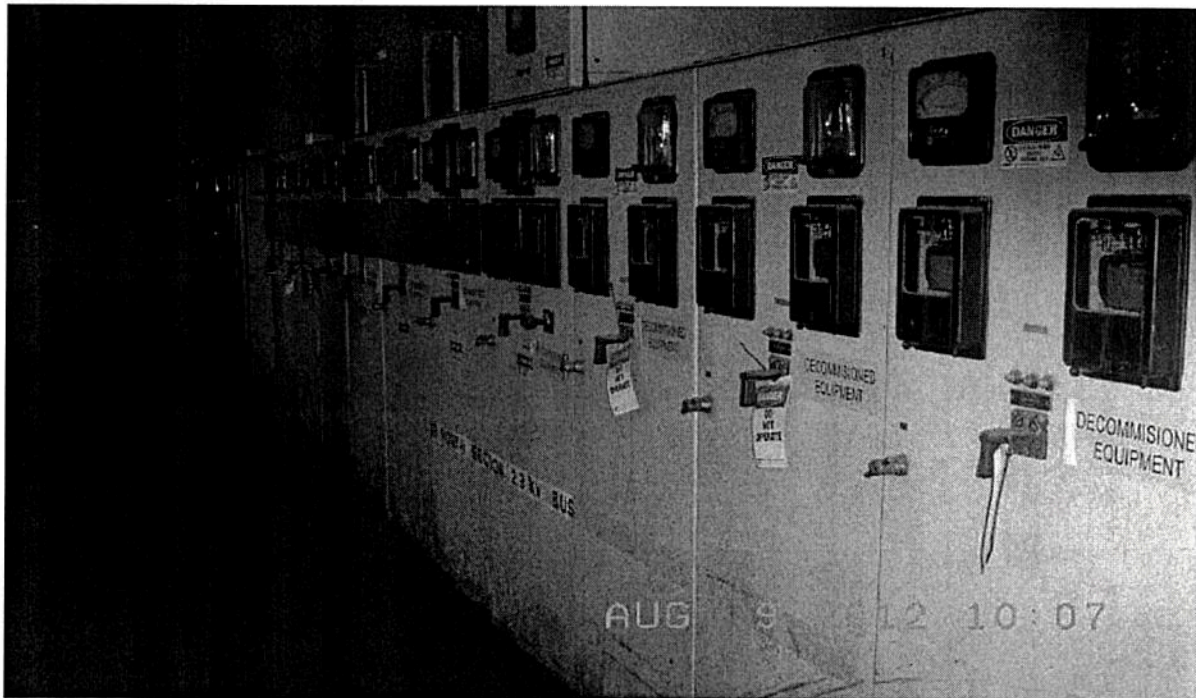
(a): Some of the decommissioned equipment at the PEPCO facility.
